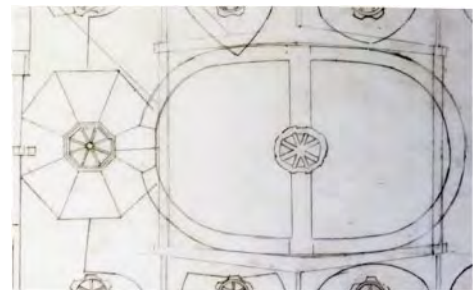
Quito, Santa Clara church, detail of roof plan, transept and central aisle domes (CIMPC 1993b).
